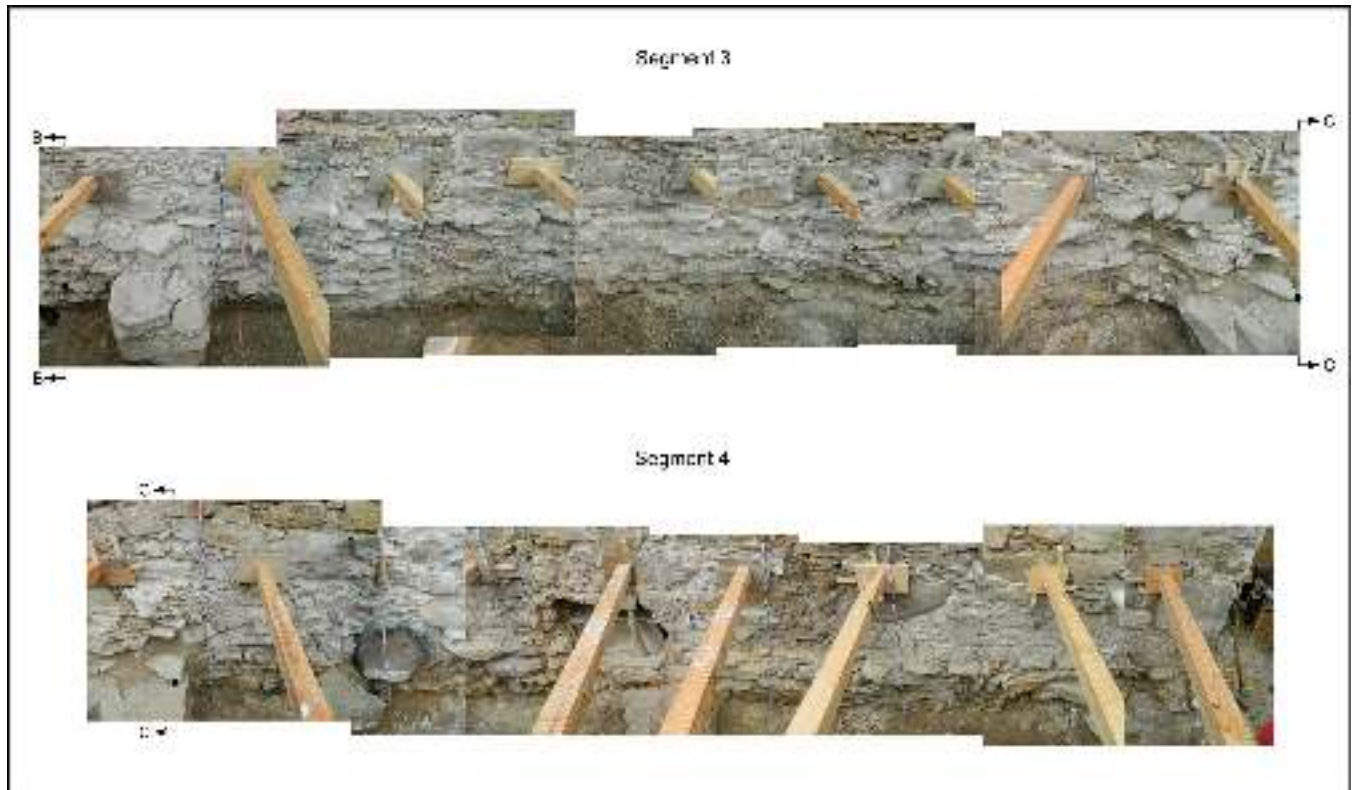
Segments 3 and 4 of the west wall of the church foundation.
